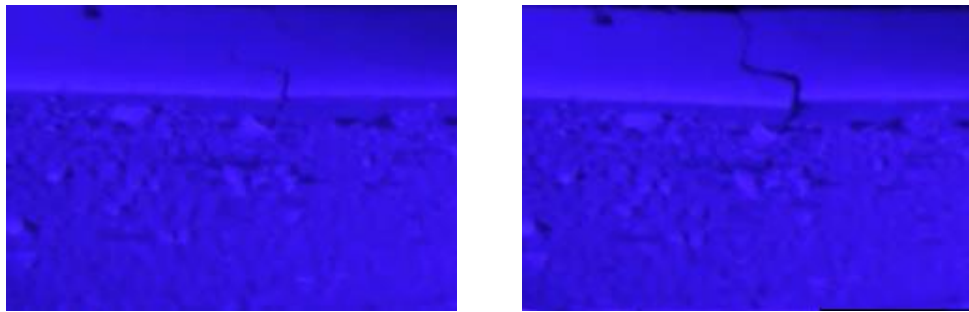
Crack opening after heating in Column 3 (left at end of heating, right at end of cooling).
